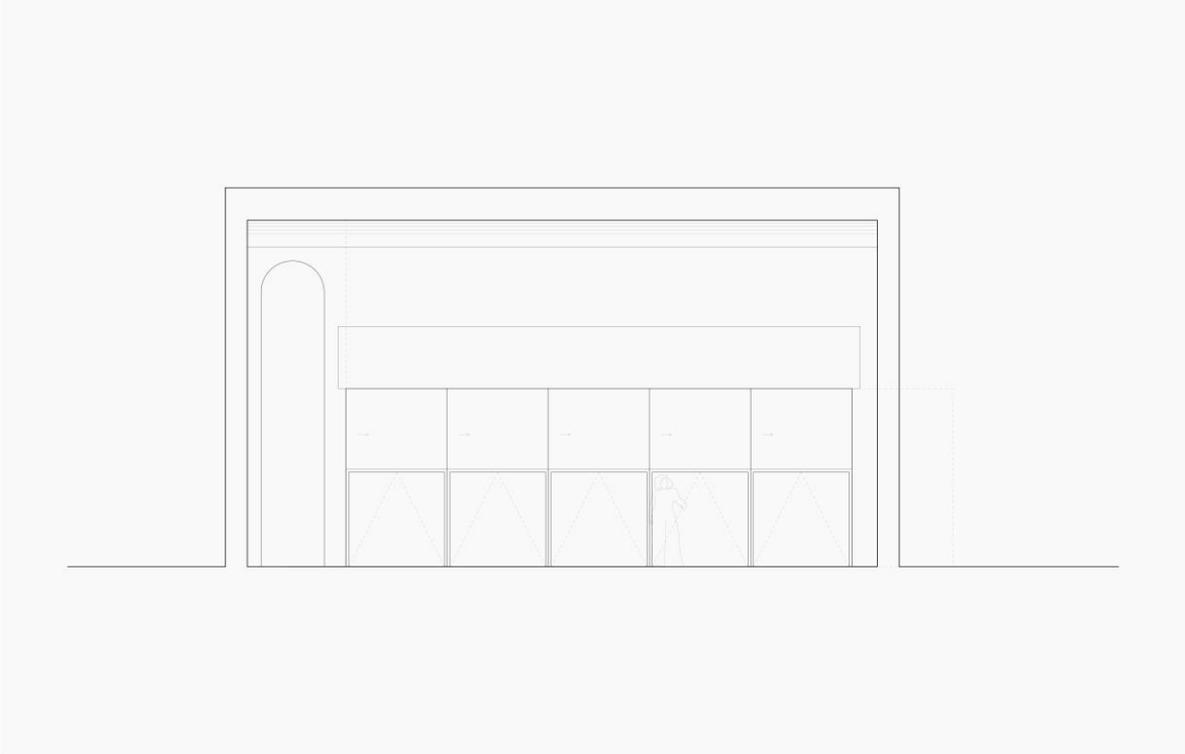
CAD drawing of interior wall that opens on to market space. Author, 2021.
